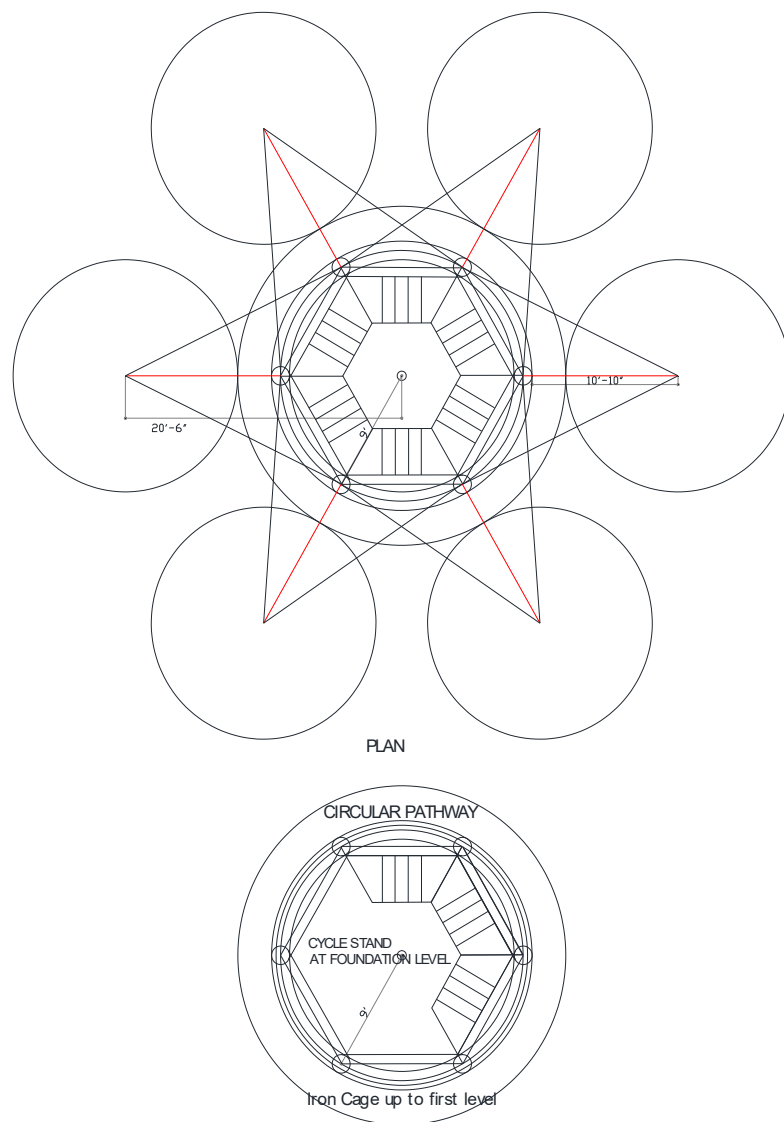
Plan of Tree housing for 6 houses at one level, detail of staircase and cycle stand
